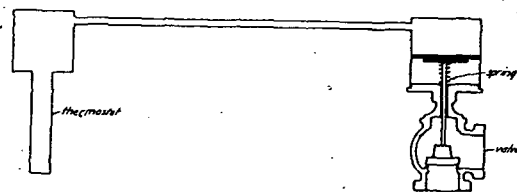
EXAMPLE OF UNIT TYPE THERMOSTAT
